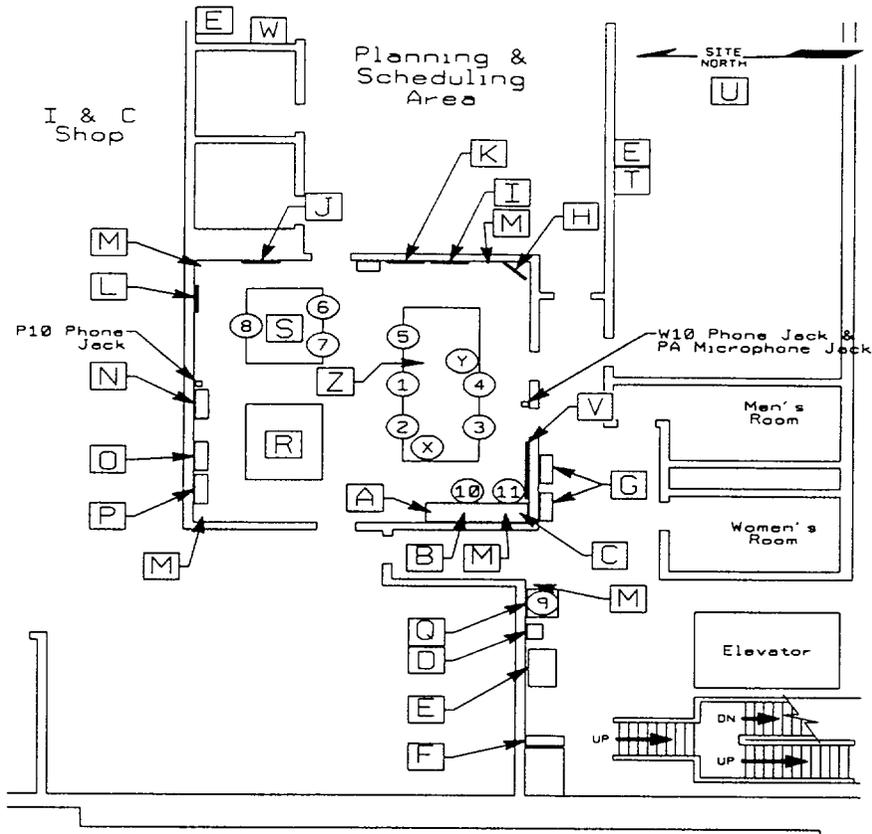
TYPICAL TECHNICAL SUPPORT CENTER LAYOUT
